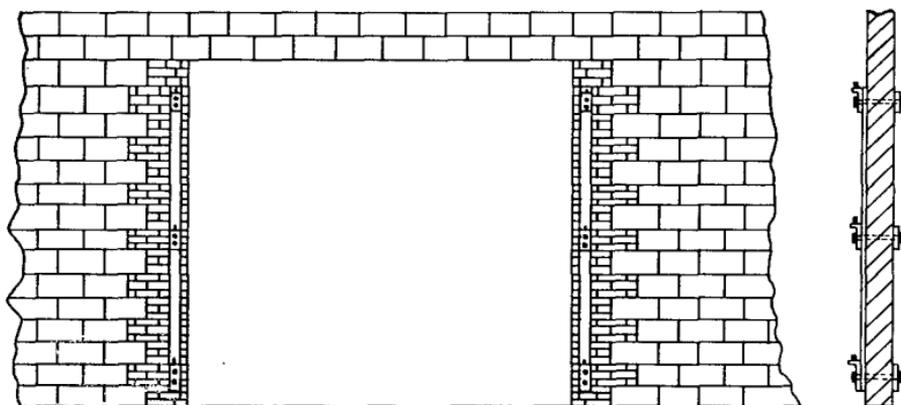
Concrete block wall prepared for doors swinging in pairs — lap mounted, standard method.
